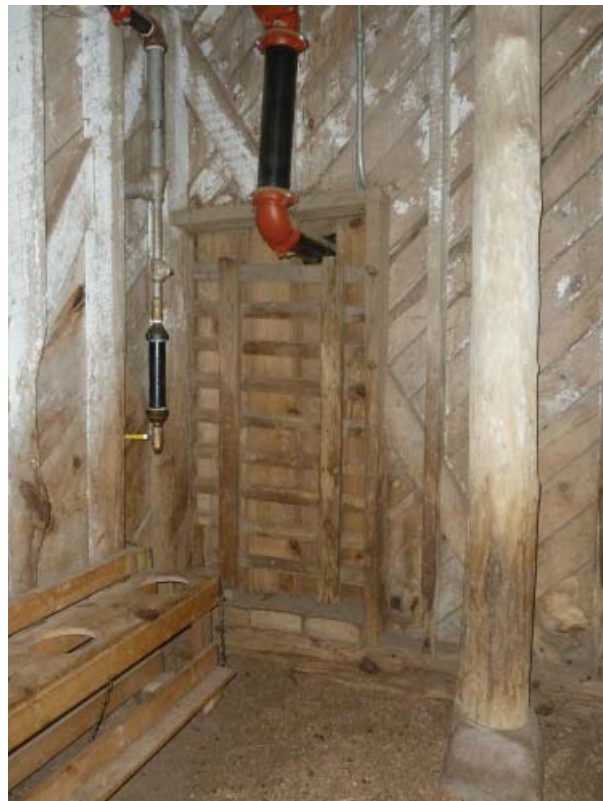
Goat Barn: doorway on east wall to Horse Barn.
